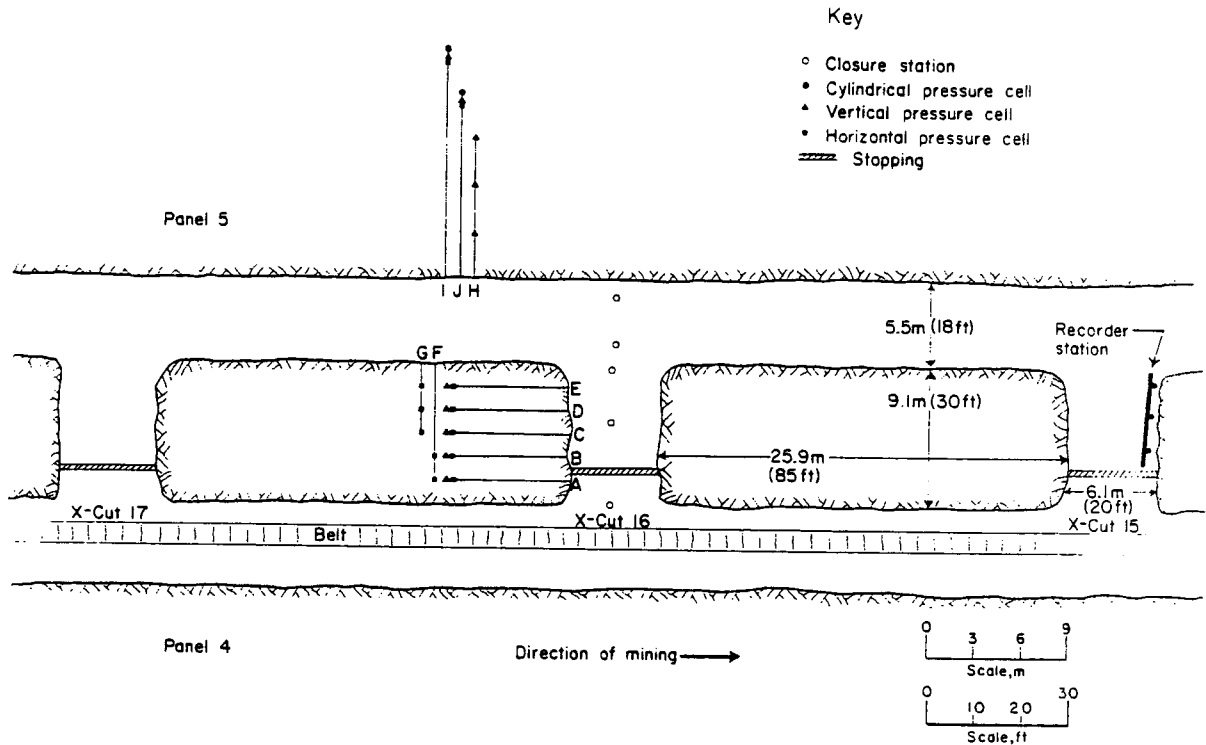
Detail of two-entry instrumentation plan. (The plan is identical for Sites 2 and 3.)
